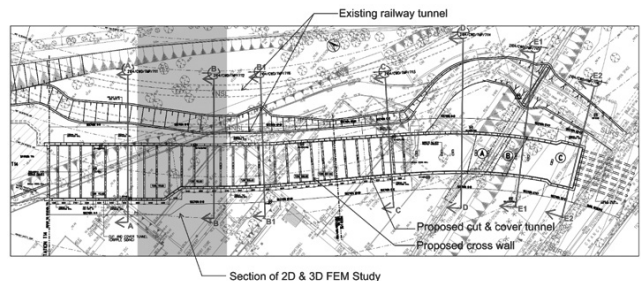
Layout of cut and cover tunnel excavation in the vicinity of existing railway tunnels
